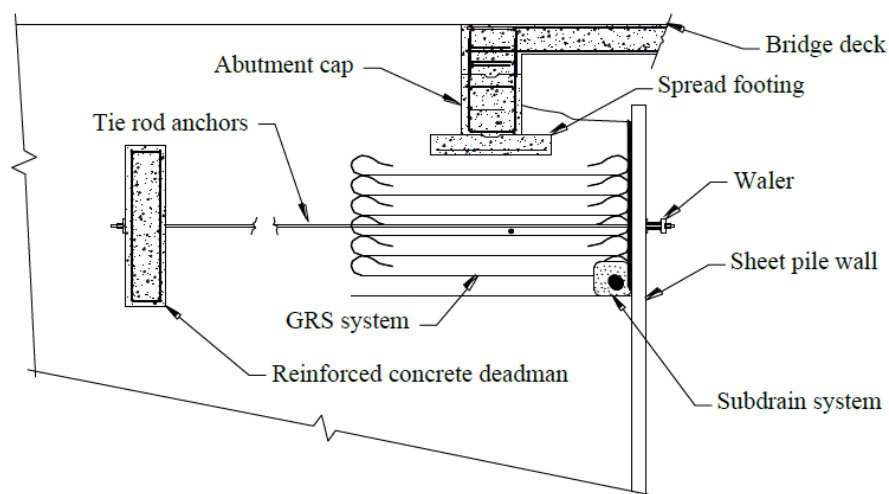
Cross-section of sheet pile abutment foundation system (Evans et al., 2012)
